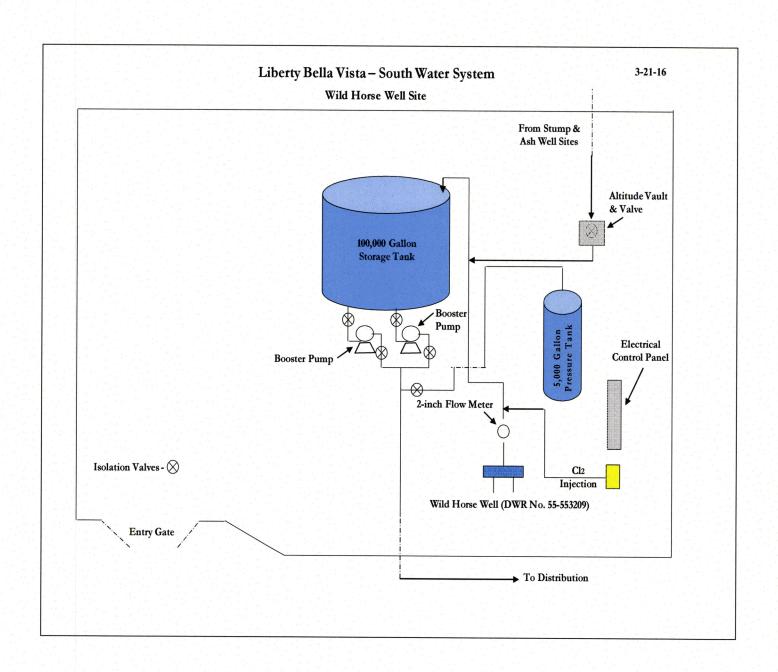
SOUTH WATER SYSTEM WILD HORSE WELL SITE
